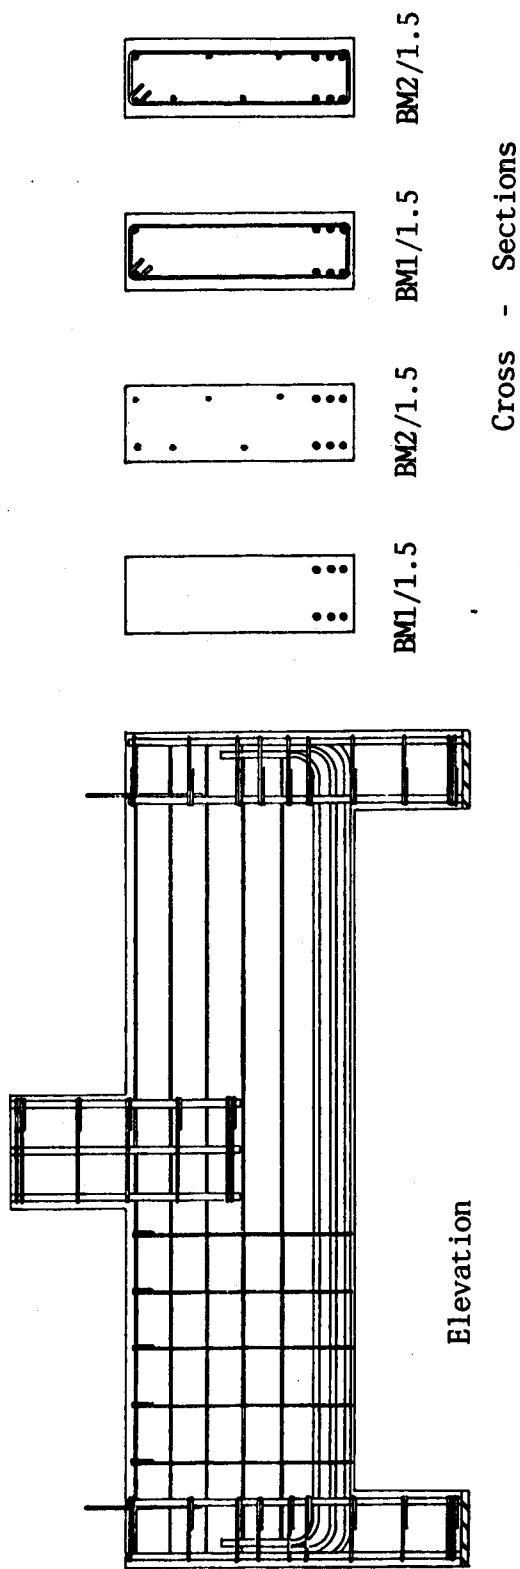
Beam 1/1.5 and 2/1.5 Reinforcement Details
